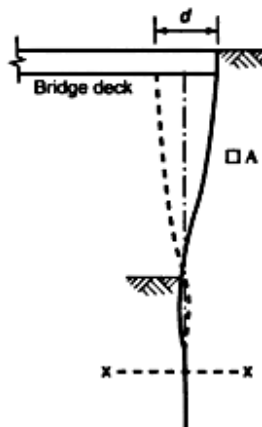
Sheet pile abutment retaining wall showing the cut-off point at depth $x-x$. The soil element A is close to the retaining wall and supports stress states, as shown in Figure 6.9
